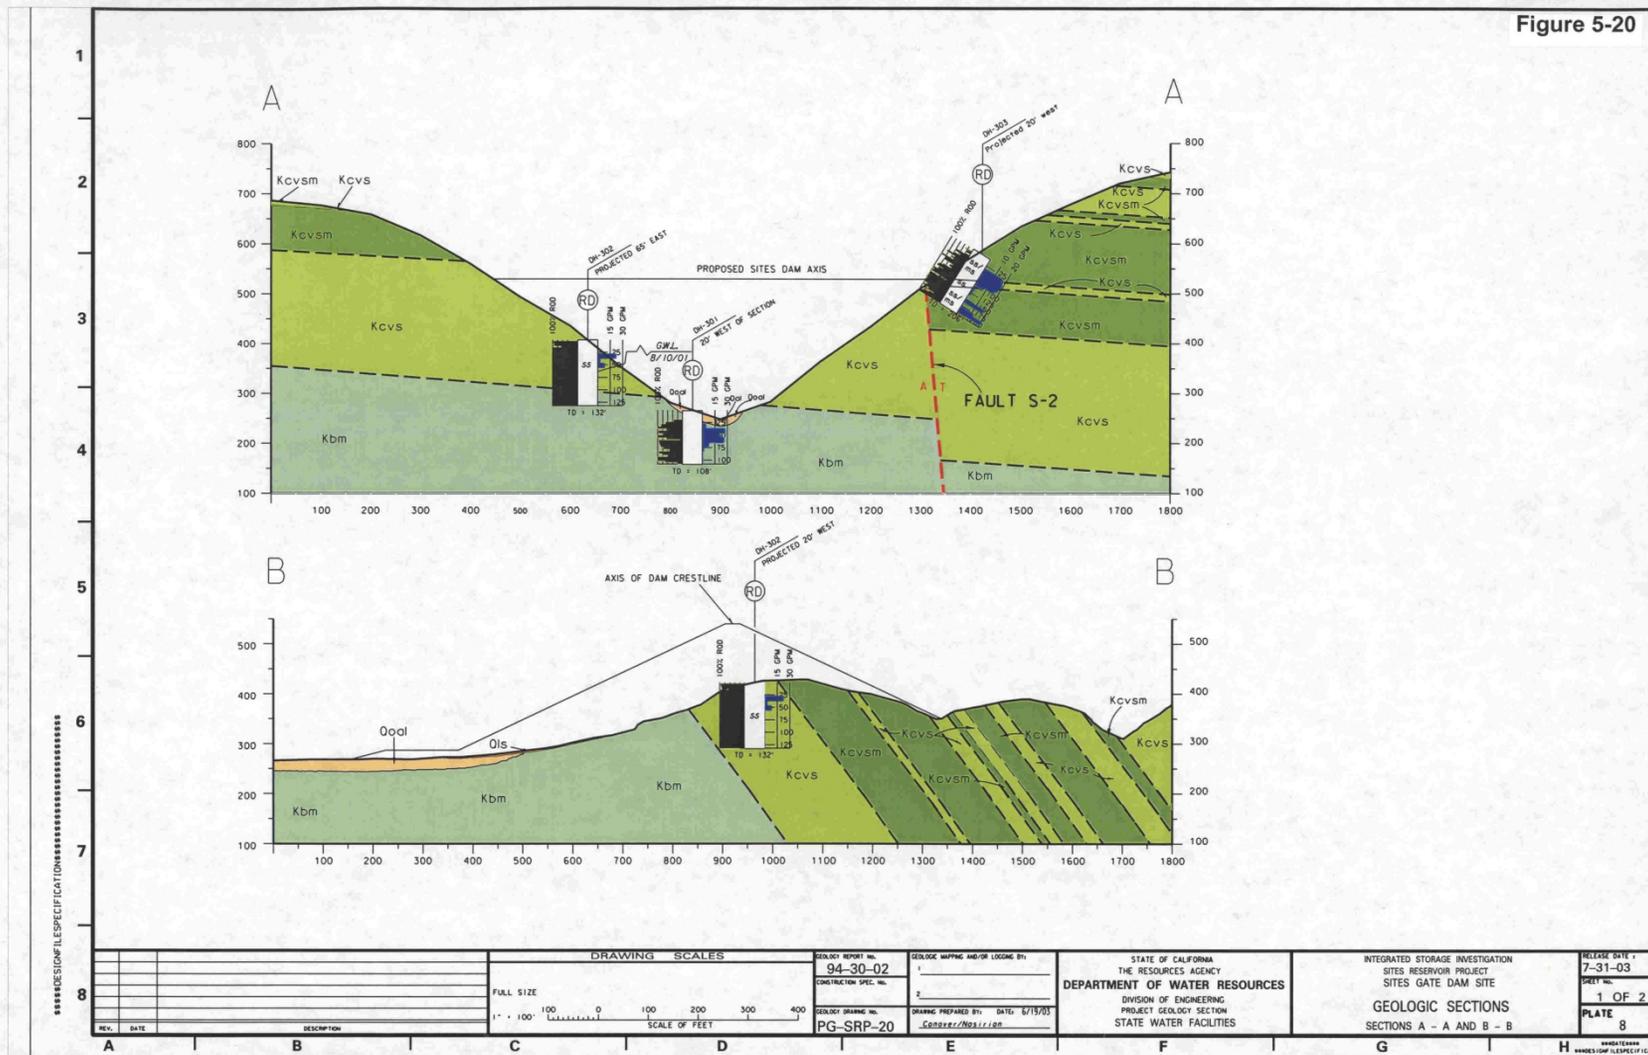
Sites Dam Site – Geologic Sections – Sections A-A and B-B
